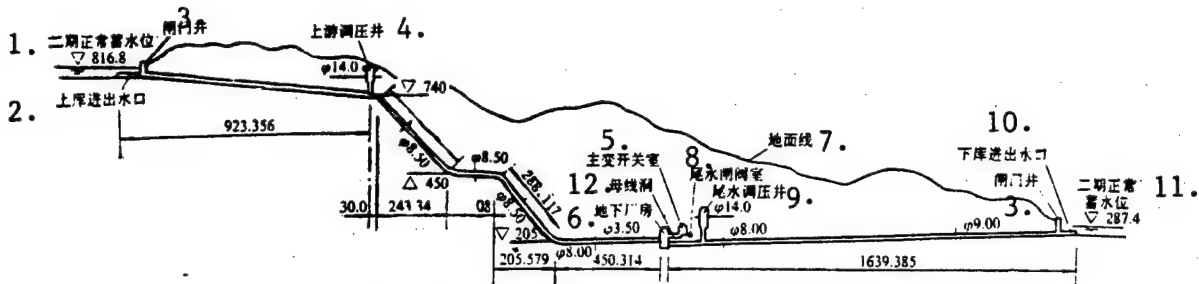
Vertical Cross-Section of Water Diversion and Plant Building Systems
